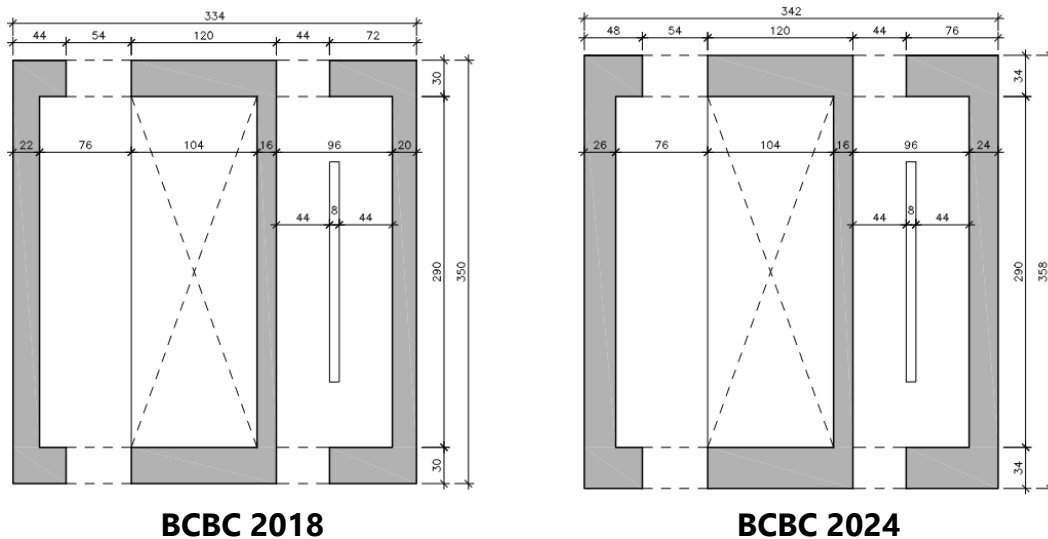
D – Concrete Tower Design Group 4 Comparison Plan
